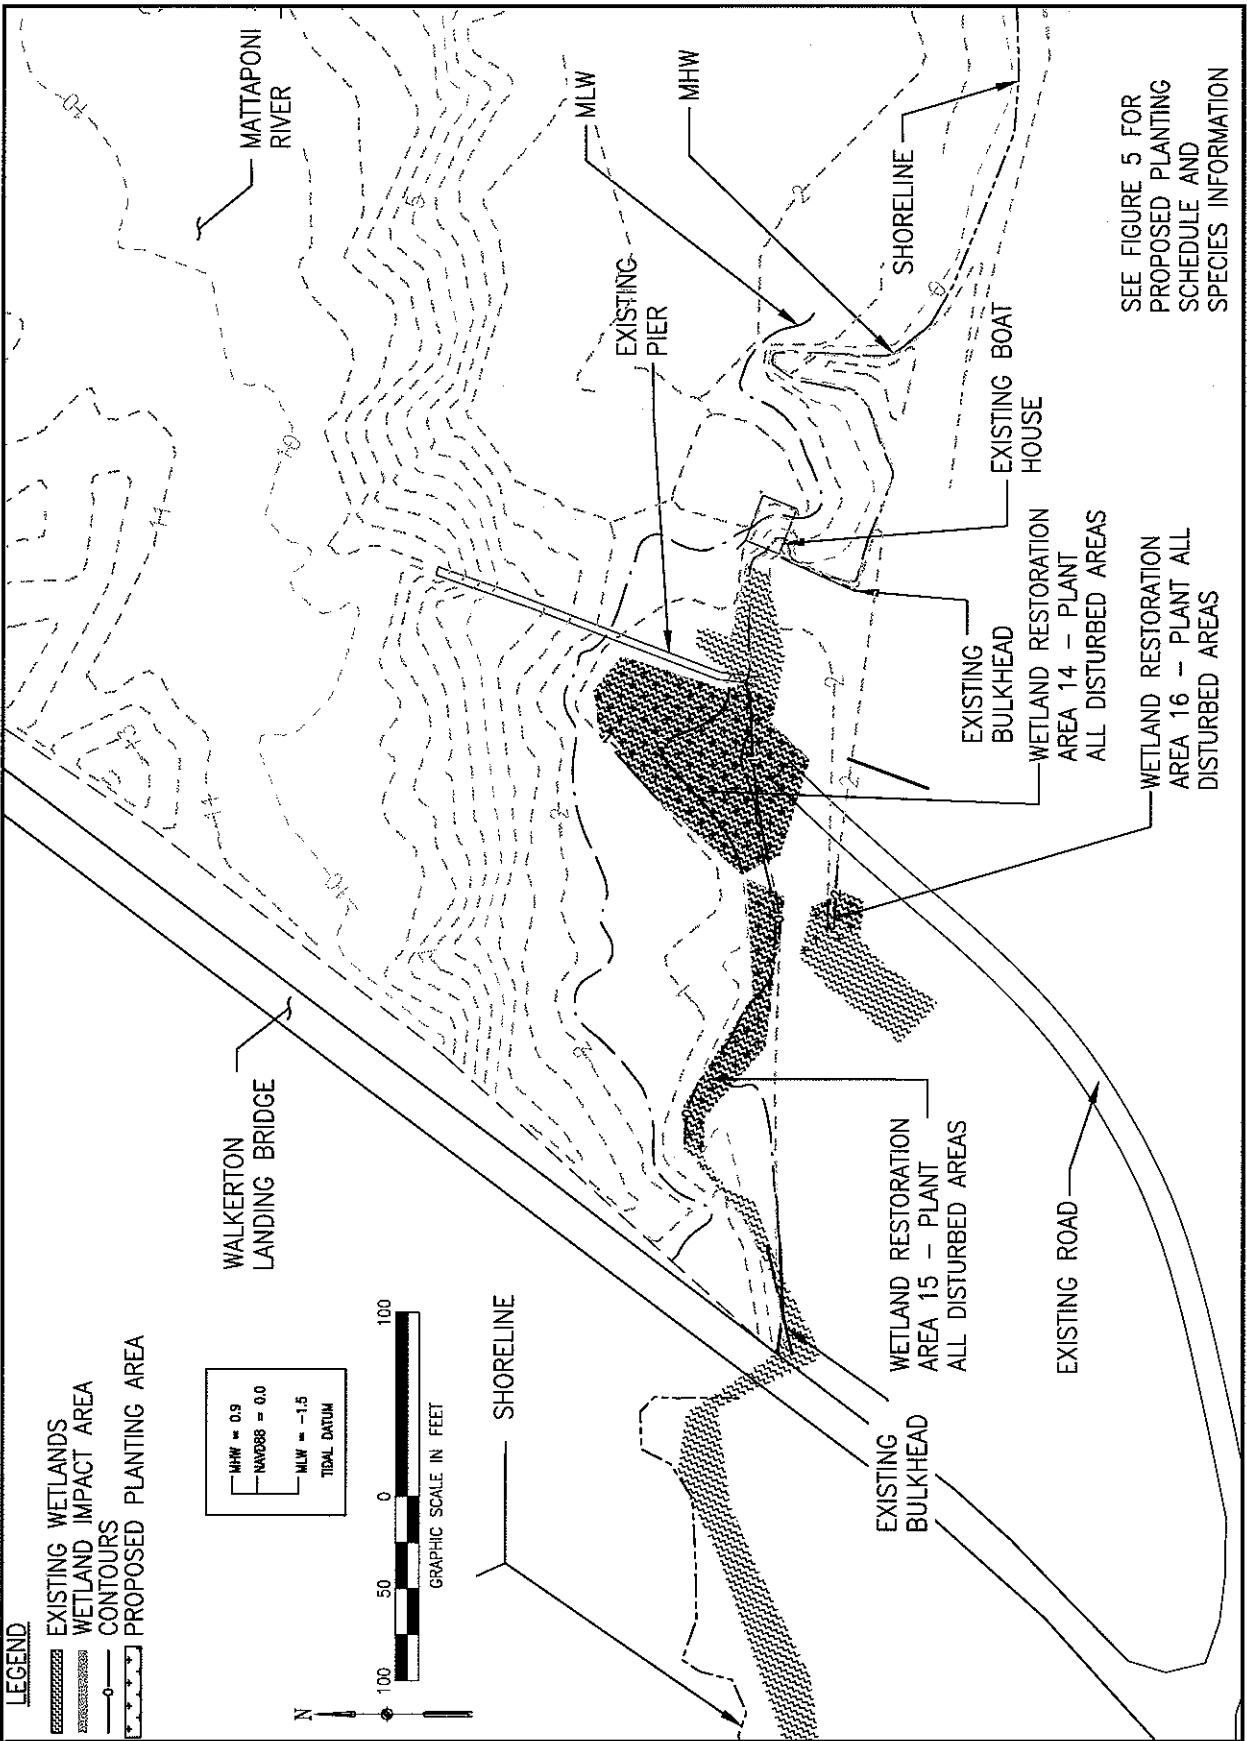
PROPOSED GRADING PLAN FOR WETLAND RESTORATION PLAN, LARGE COMPONENT TRANSPORT ROUTE ROLL-OFF FACILITY
